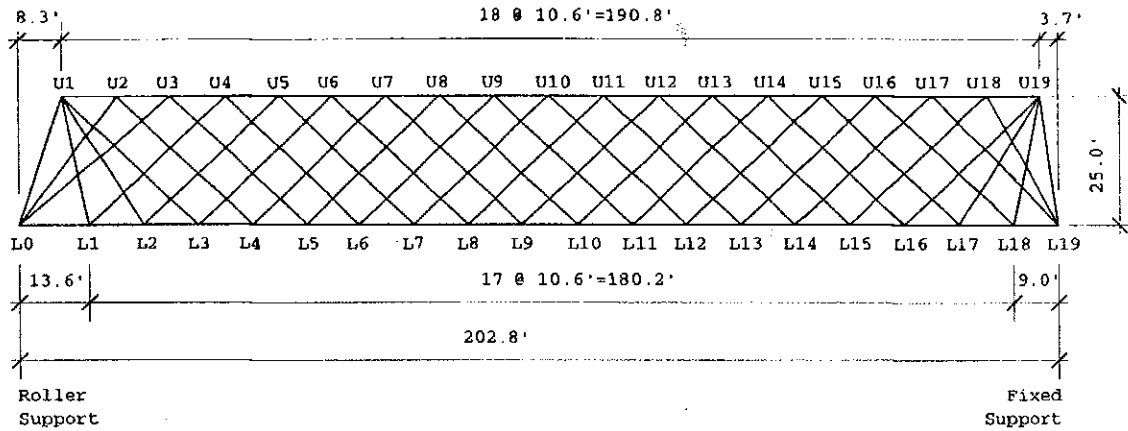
Elevation of lattice truss, Upper Bridge at Slate Run.
